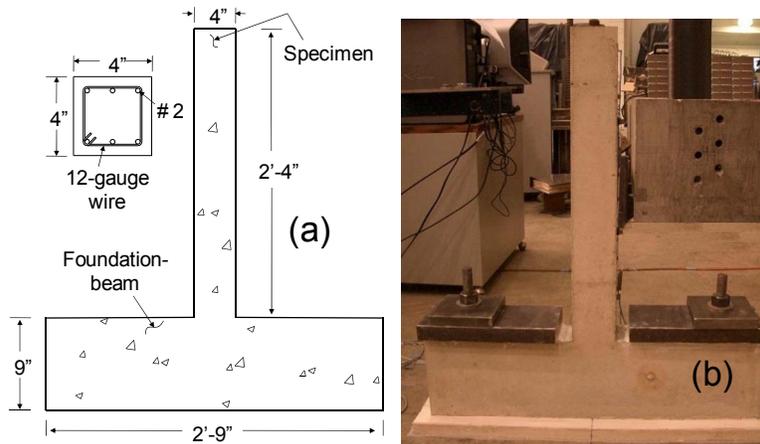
Small-scale cantilever beam. (a) Reinforcing details. (b) General view.
